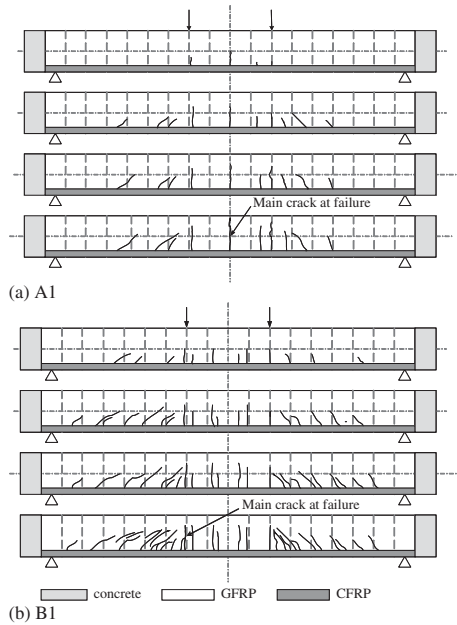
Typical progressive crack patterns of hybrid FRP/concrete beams.
